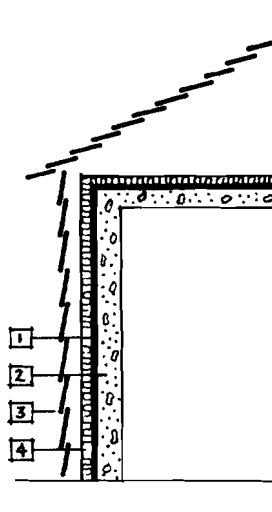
Insulated, structurally supported air barrier with rain protection
